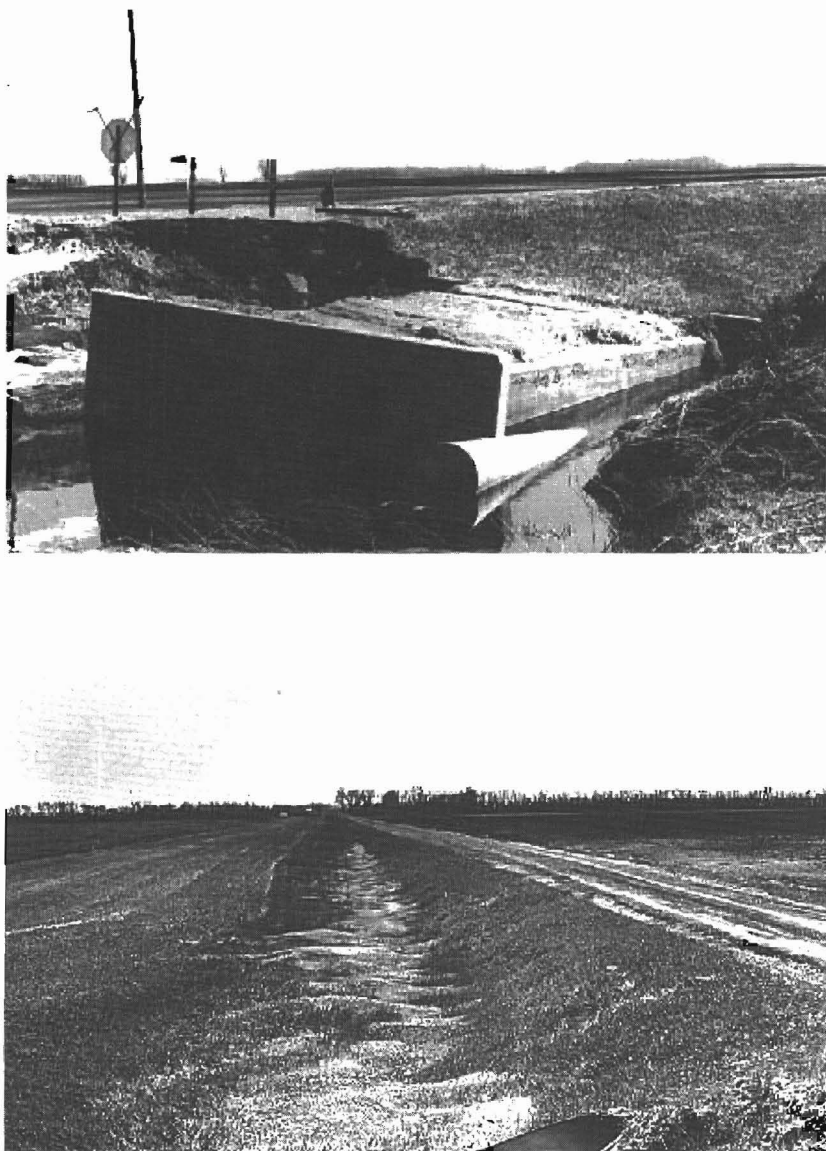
Damage to rural roads south of Grand Forks. A small bridge at the northeast corner of a section was washed out when floodwater breached the road surface. The lower photo shows how the gravel has been washed off the road into the ditch north of the road. (Photos by J. Bluemle)
